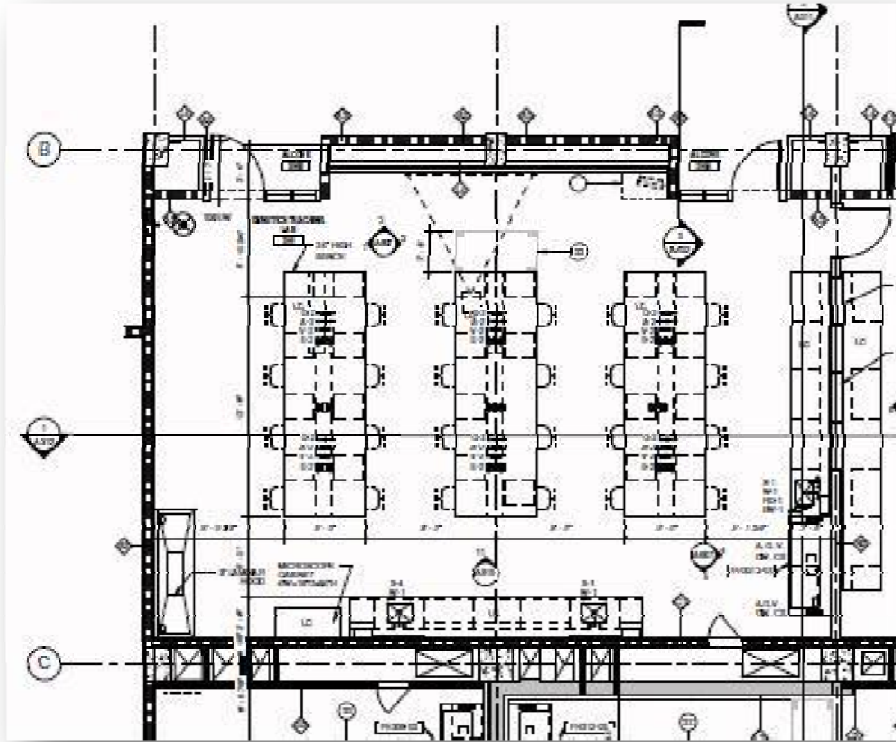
GENETICS TEACHING LAB FLOOR PLAN
